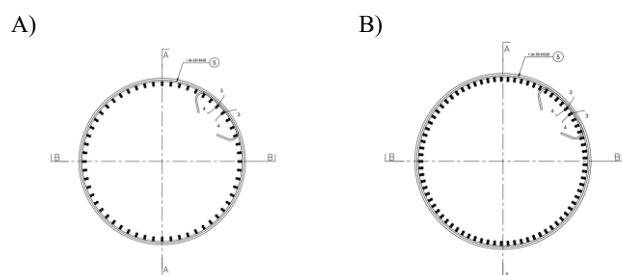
Pier reinforcement sections : a) Pier 1 ; b) Pier 2.
